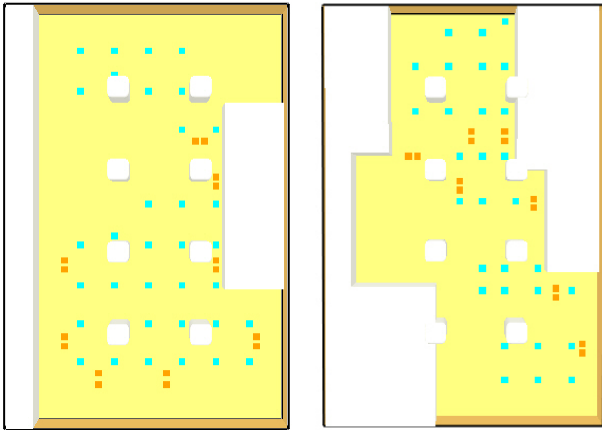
Diffuser and pole (white) arrangement of the first floor lobby (left) and of the second floor lobby (right)
